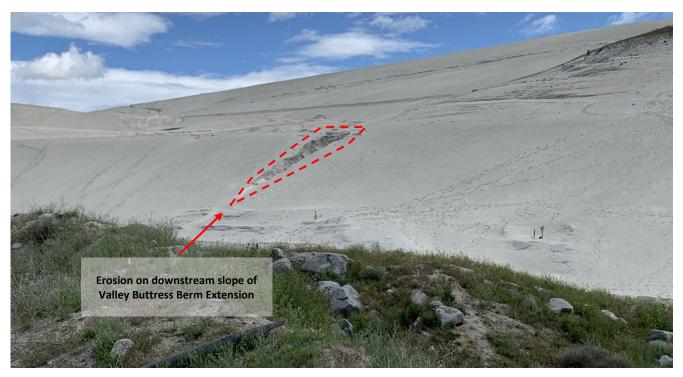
Overview of South Dam downstream slope from crest – looking west (LL-2020-04)
